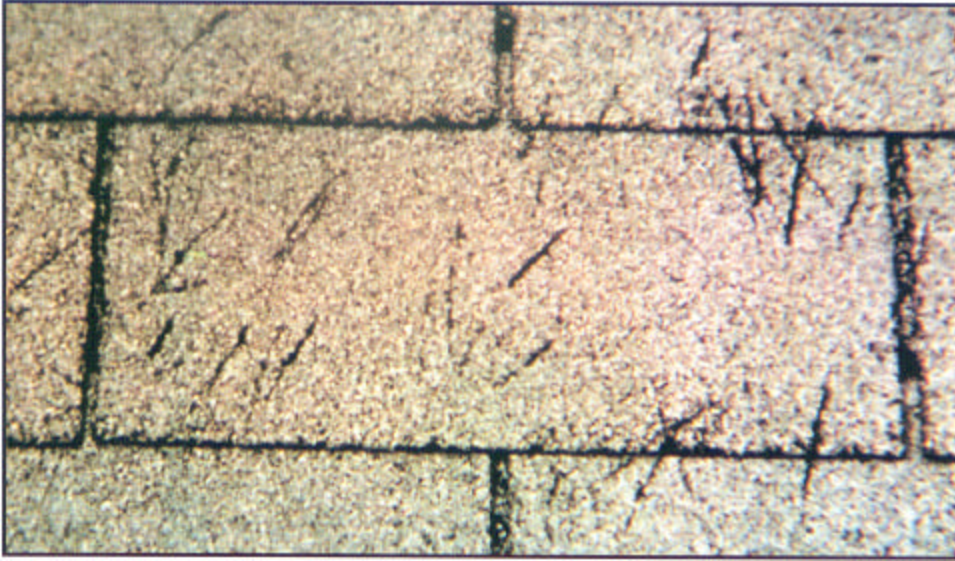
Mechanical damage to these shingles was caused by a roofer trimming shingles without a cutting board.
